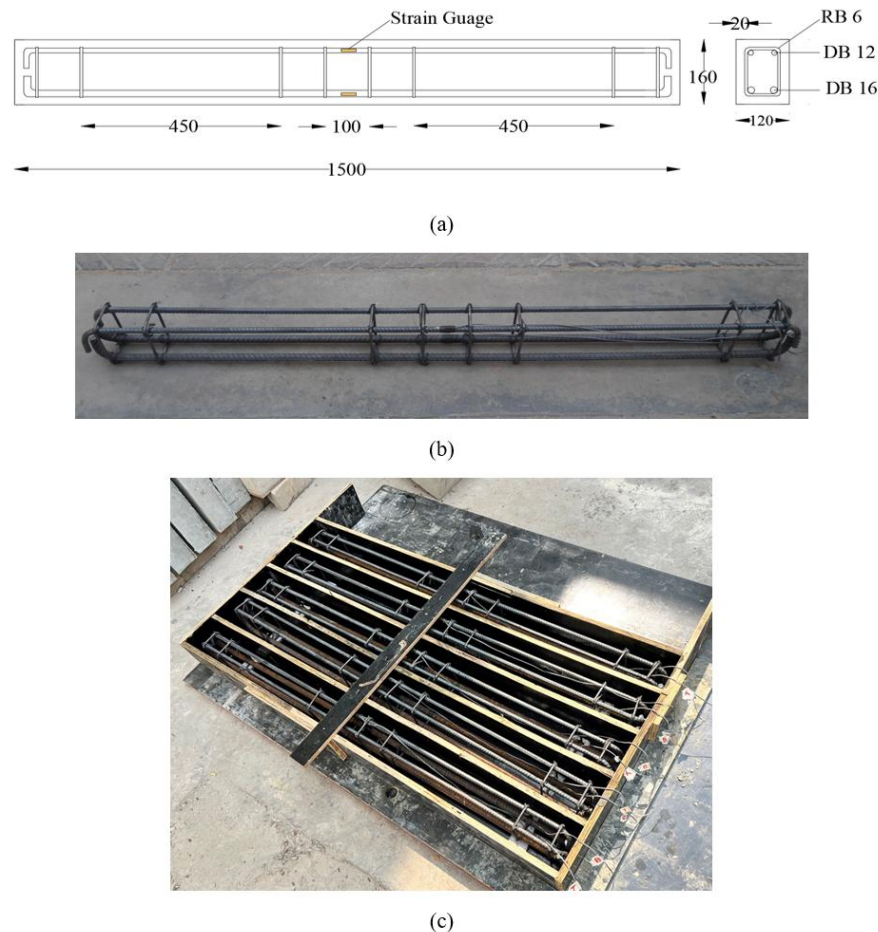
(a) Structural details of RC beams, (b) steel bars, (c) typical formwork (*Note: All units are in mm*).
